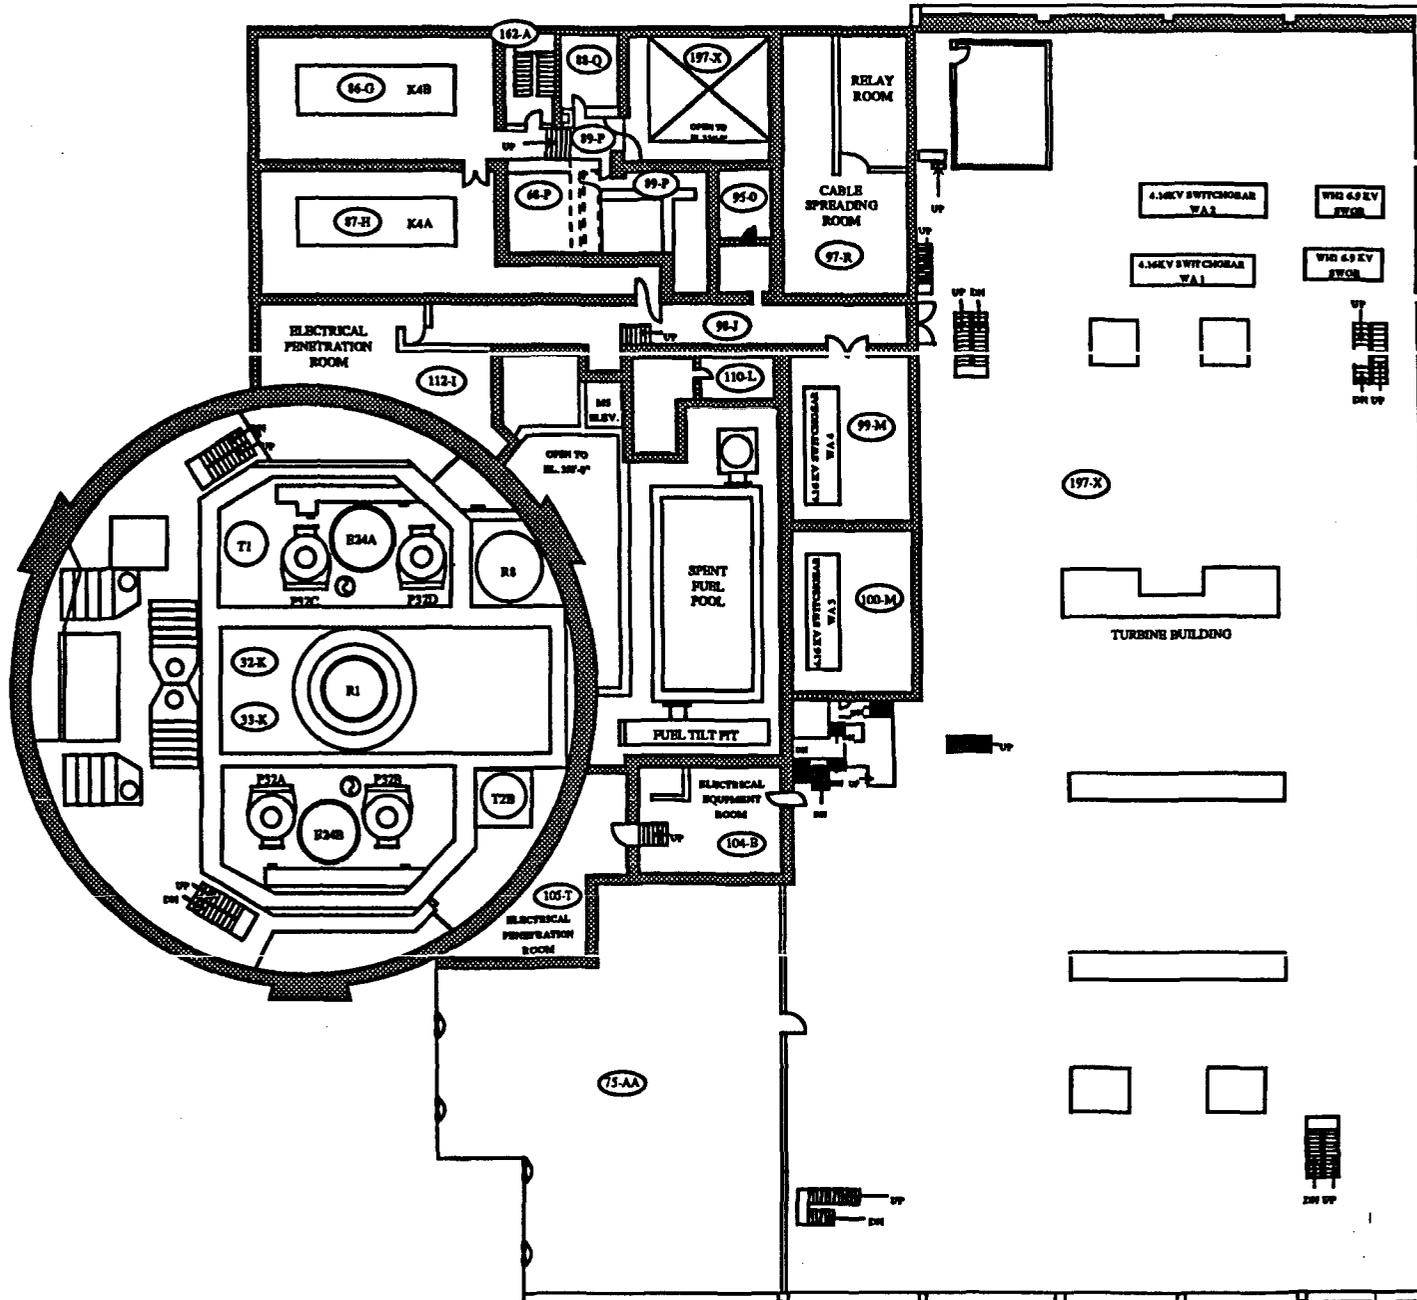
FIRE ZONES ON ELEVATION 368'/374'
